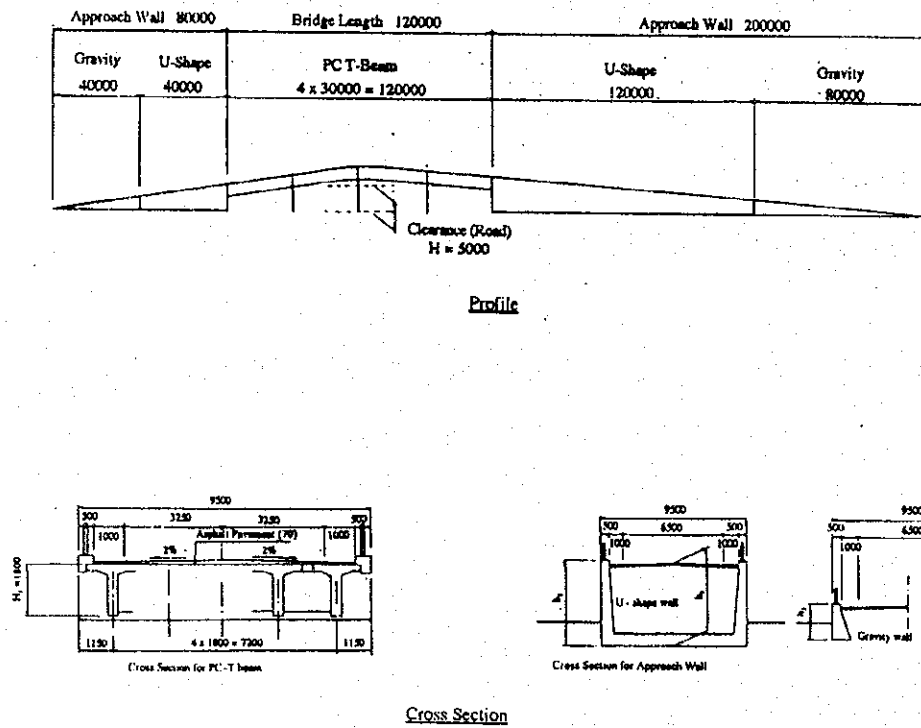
Typical Cross Section and Profile for East Cross Section
